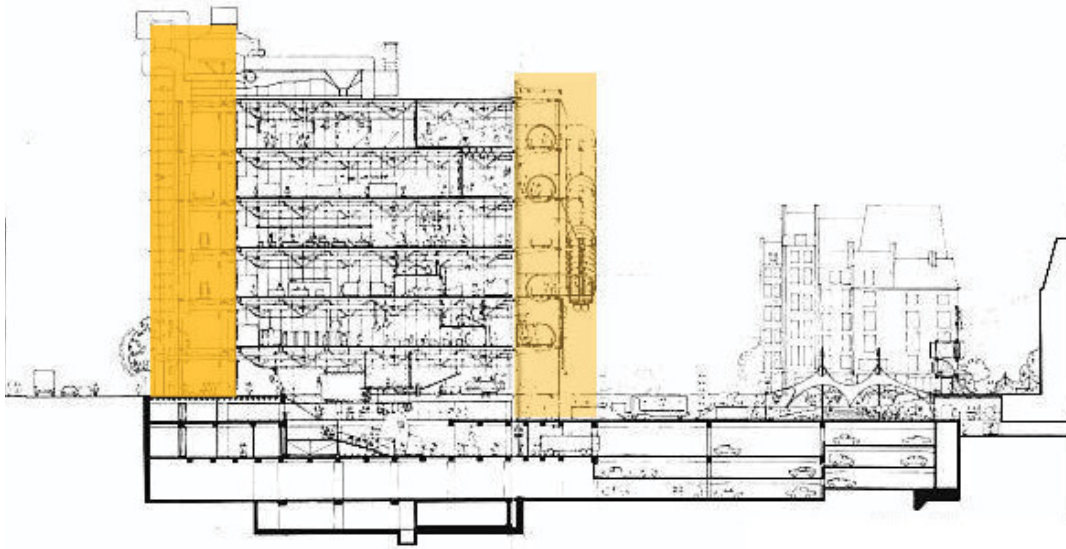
Section and Plan. The buildings services and circulation located on the buildings edge. [Edited by Author]
